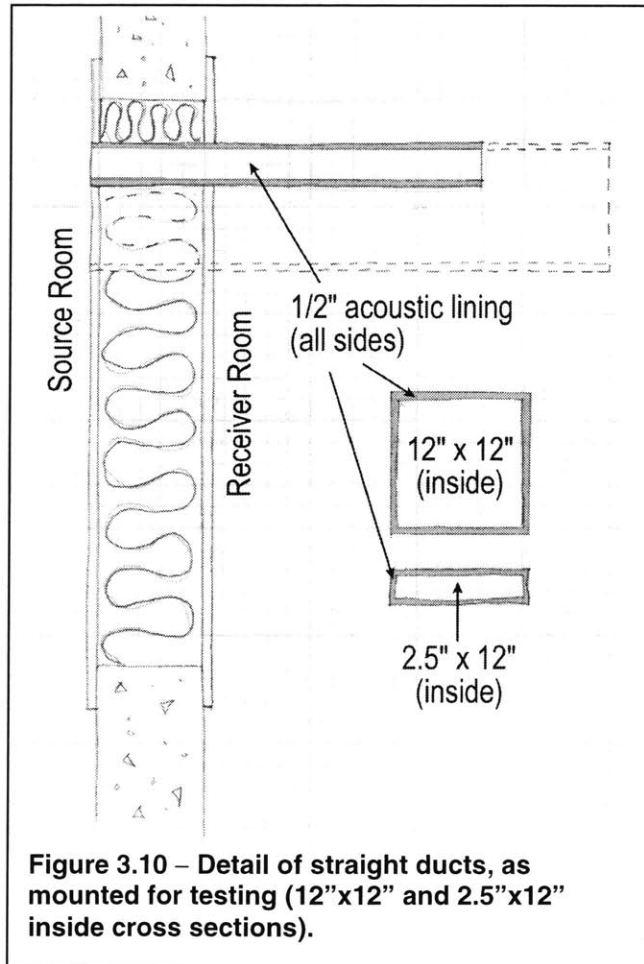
Detail of straight ducts, as mounted for testing (12”x12” and 2.5”x12” inside cross sections).
